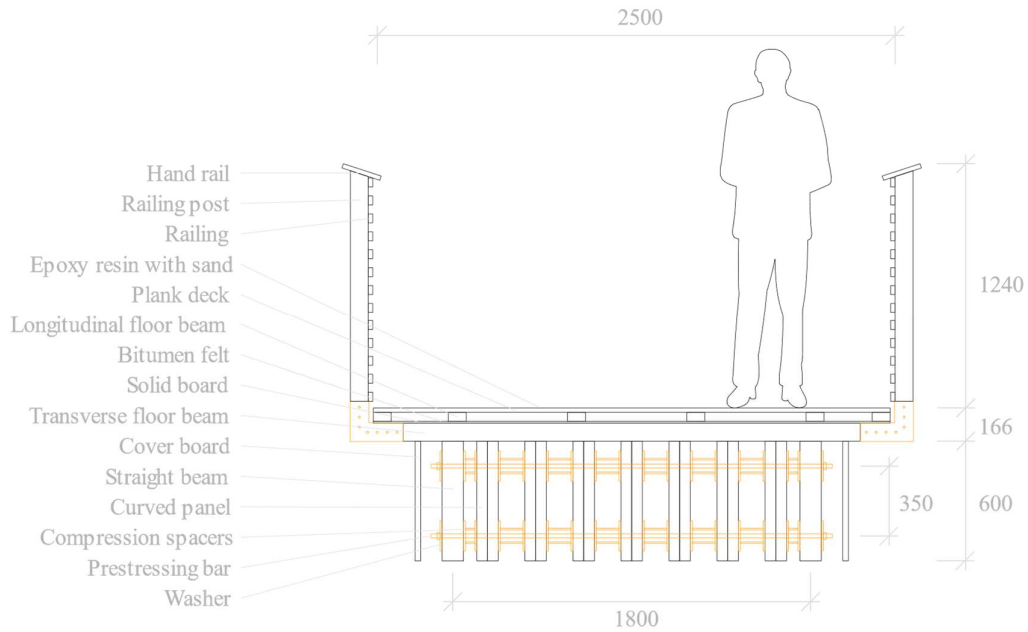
Cross-section of the superstructure and bridge deck with corresponding materials and dimensions.
